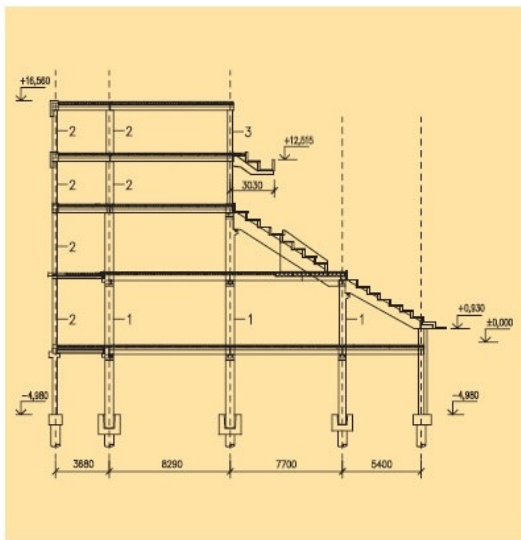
Main frame system: 1 – Continuous columns, 2 – Divided columns, 3 – Steel columns
